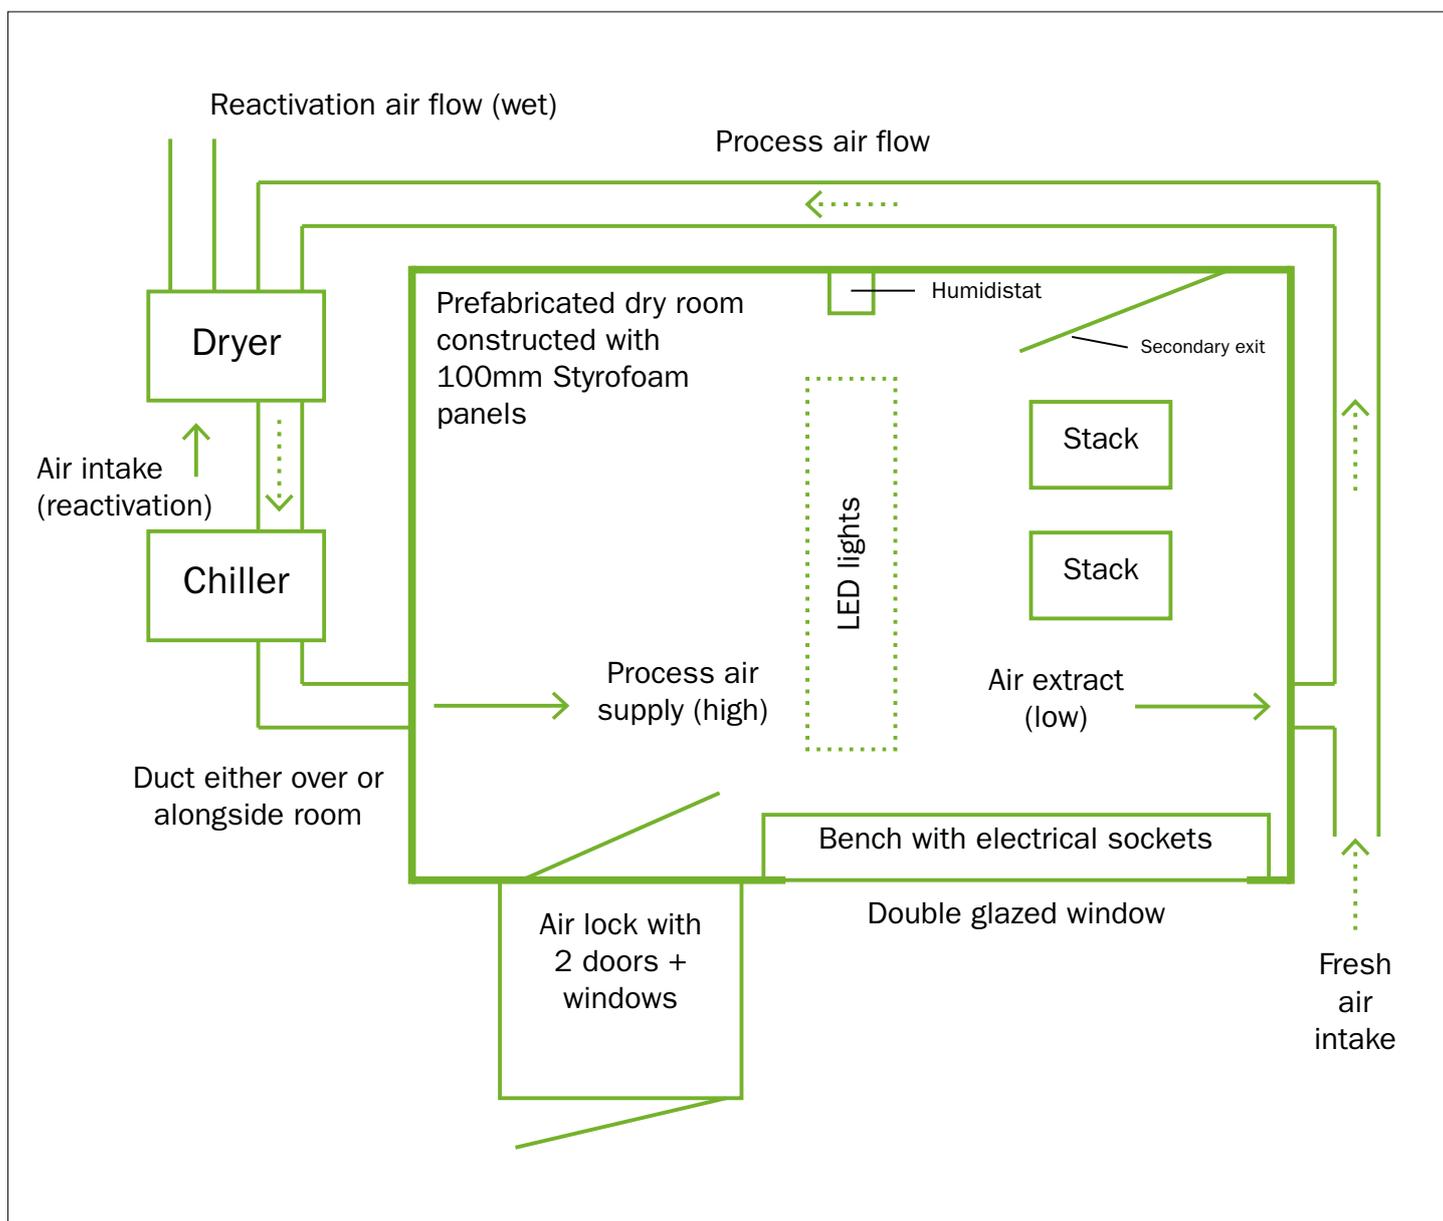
Possible layout of dry room facilities. The direction of airflow is indicated by the arrows.
